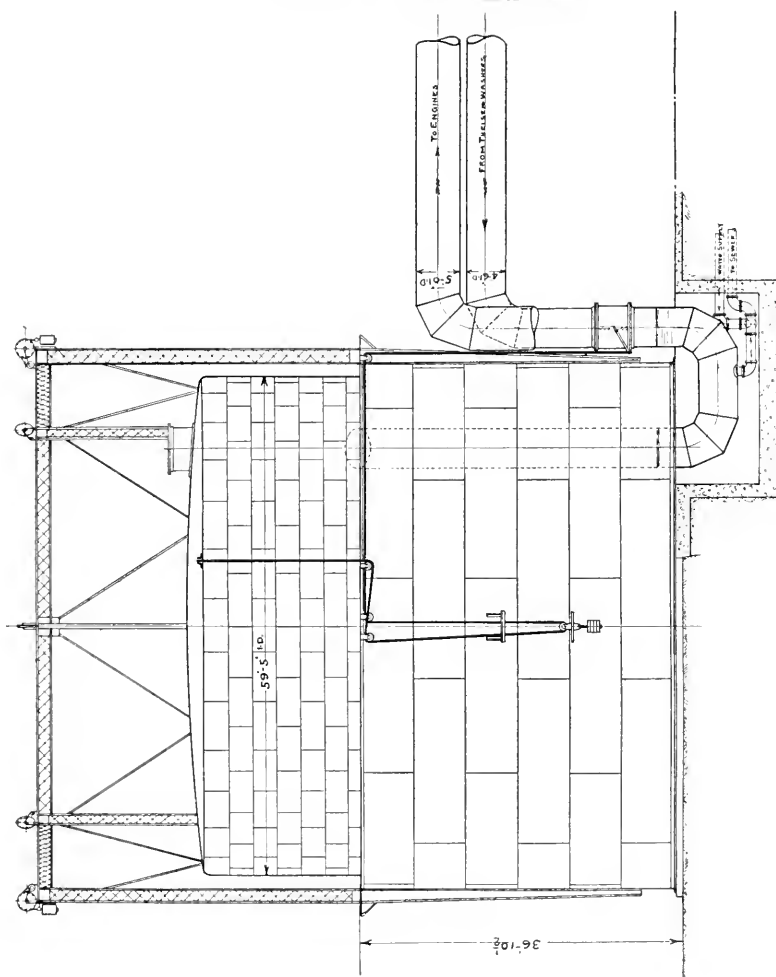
GAS HOLDER AND AUTOMATIC BUTTERFLY VALVE
